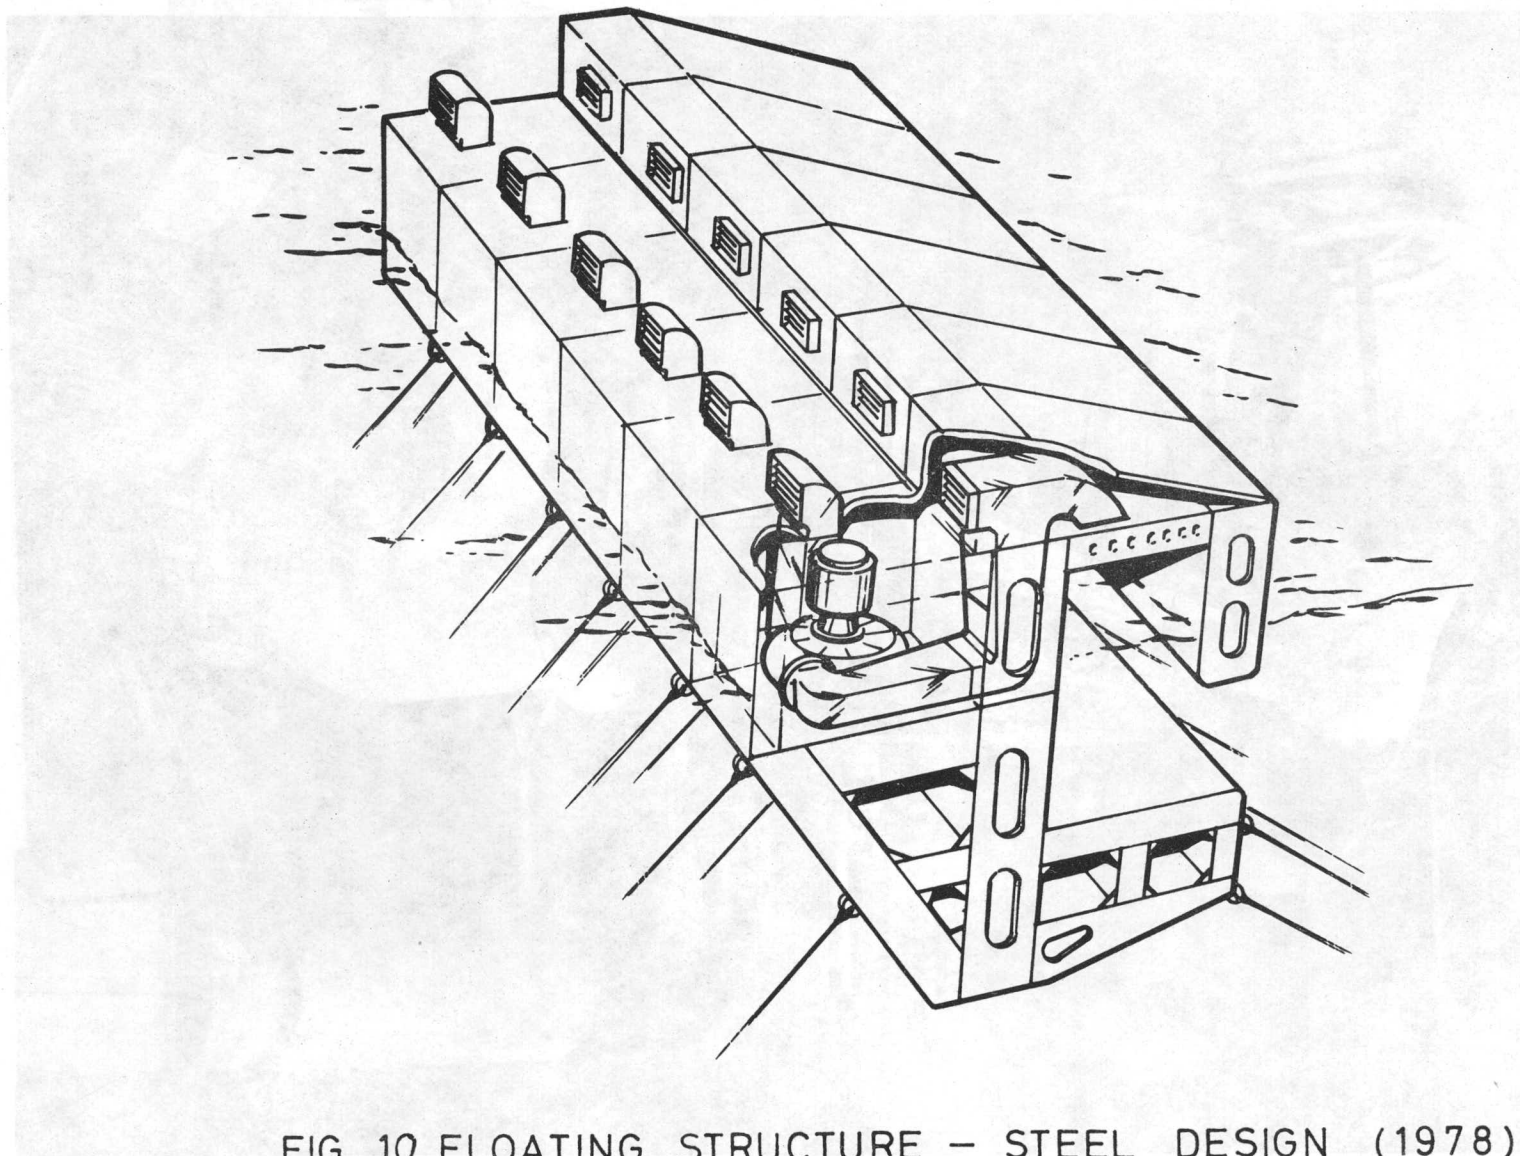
FLOATING STRUCTURE - STEEL DESIGN (1978)
